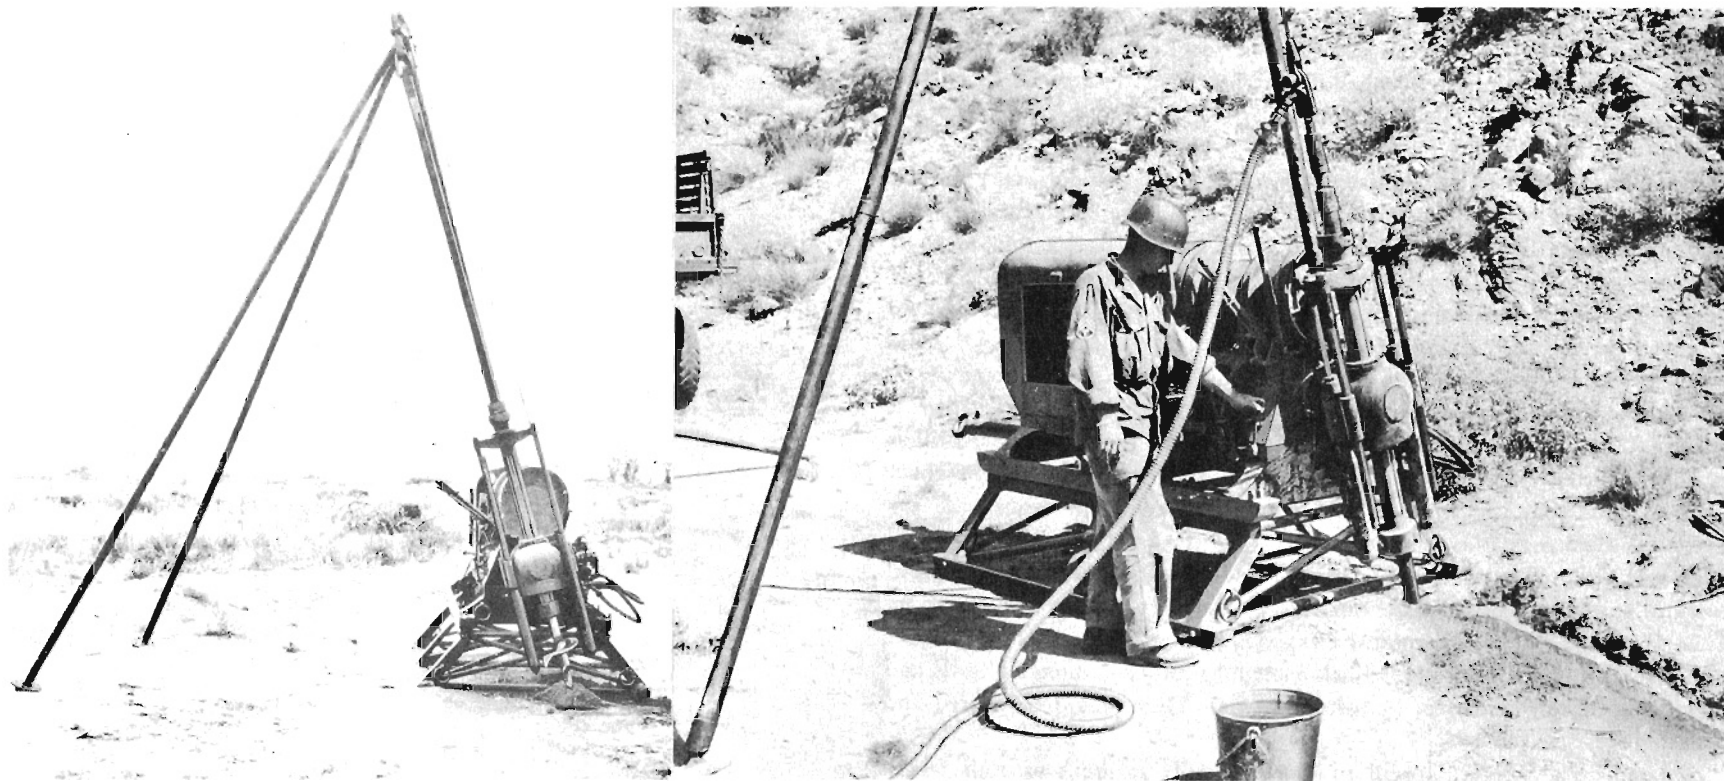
Lightweight rotary well-drilling machine. Used as earth auger and core drill.
